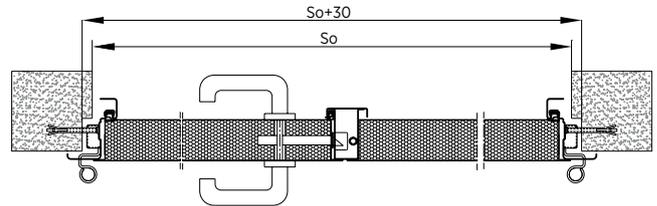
Installation of the double-leaf door with a corner frame without a thermal break to a masonry wall - horizontal cross-section
